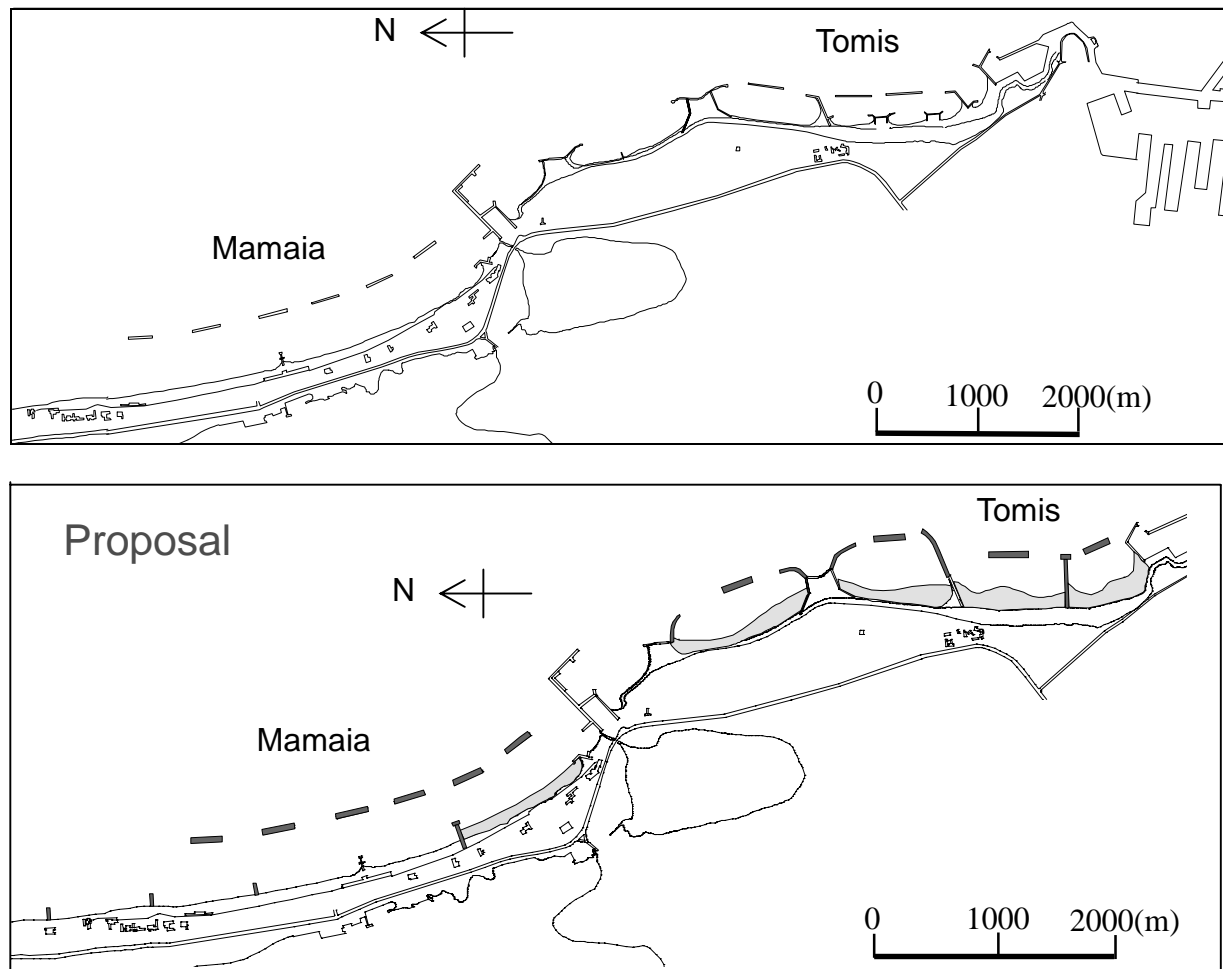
Existing and proposed shore protection facilities at Mamaia and Tomis sub-sectors
